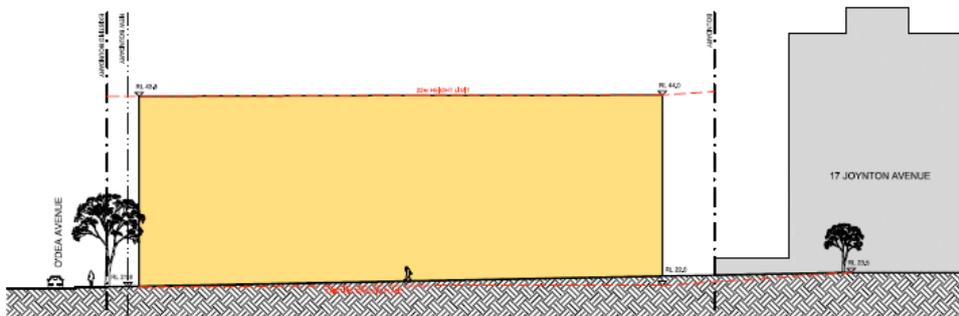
Elevation of the proposed envelopes to east viewed from the new street
